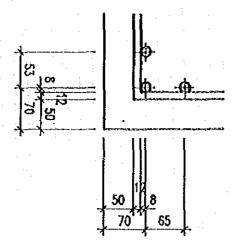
Minimum Cover and Space for PC Tendons of Pre-tensioned Beam
